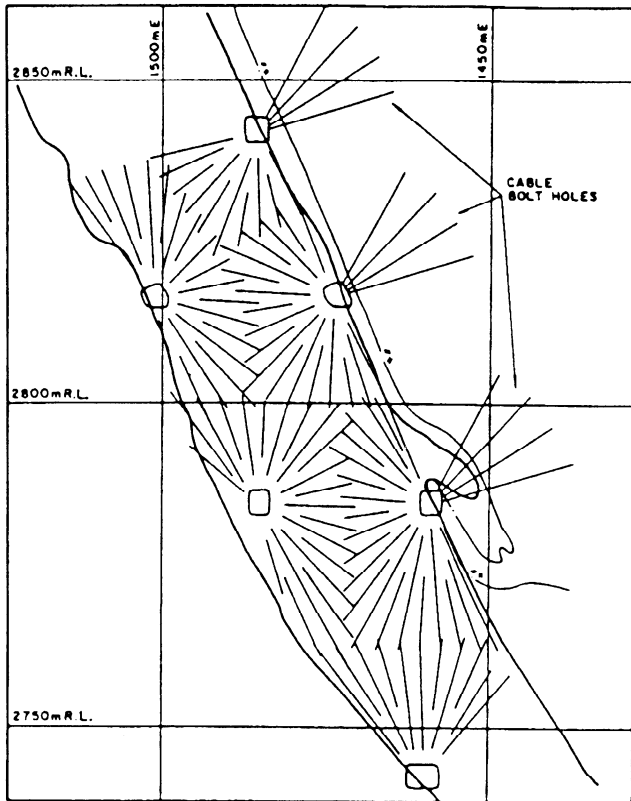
Cable bolting holes for hangingwall reinforcement drilled from stope sublevels (Goddard, 1981).
